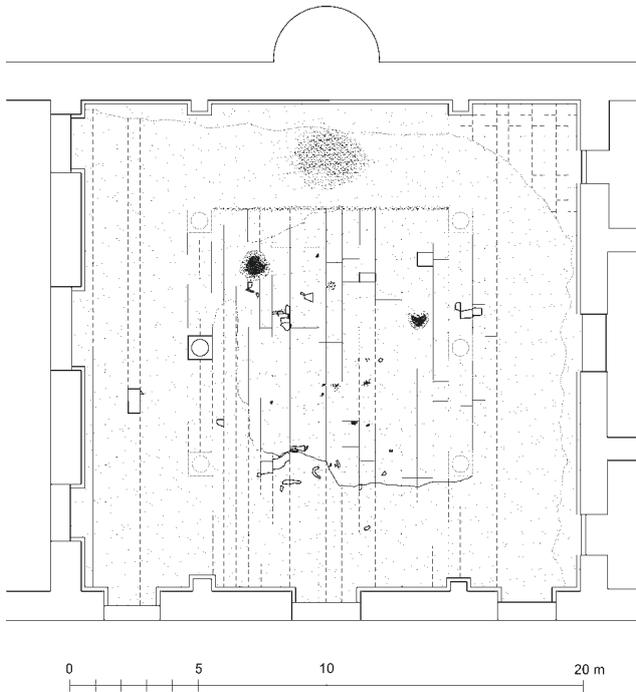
Khirbat al-Minya, three-aisled hall, floor plan (corners schematically right angles), with remains of mortar bedding and marble tiles indicating the pavement. Drawing after excavation photos. – (Drawing M. Ritter / B. Tajer 2018).
